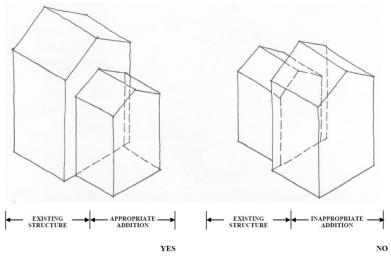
An addition to a historic building should be a secondary form that preserves the form of the historic building. A proposed addition should be no larger than two-thirds of the street frontage of an existing building.
